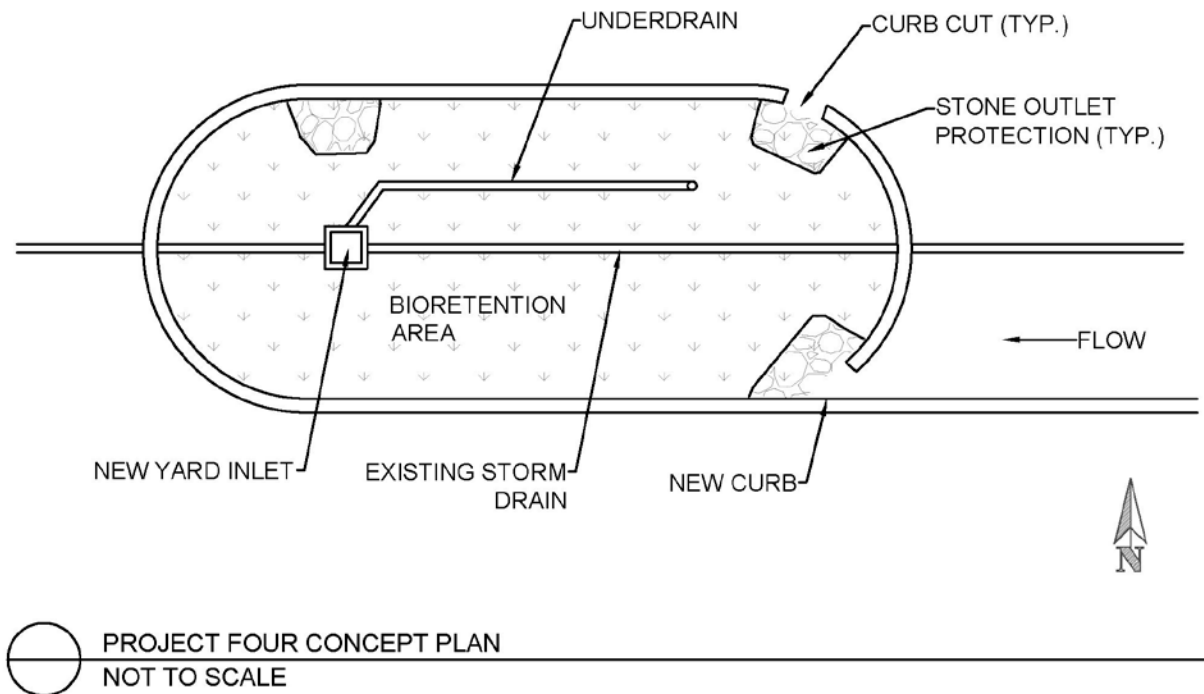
LID Pilot Project Site 4 Concept Plan
